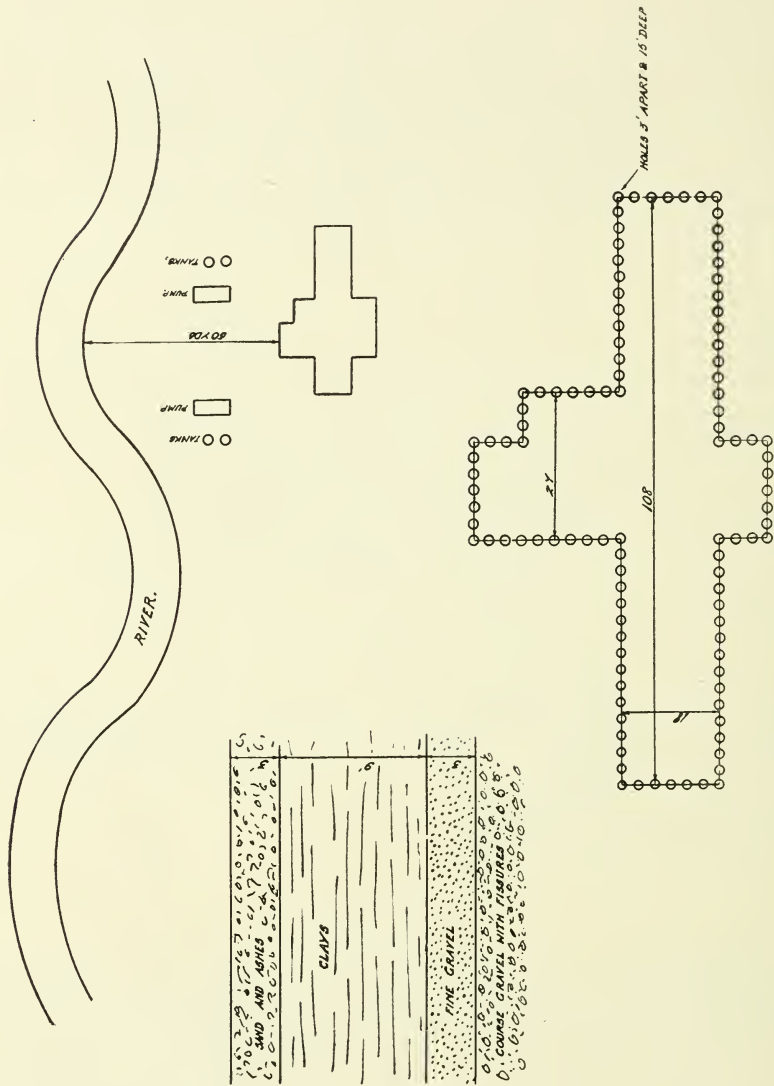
CEMENTATION OF WATER-BEARING ALLUVIAL DEPOSITS FOR CONCRETE FOUNDATIONS.
